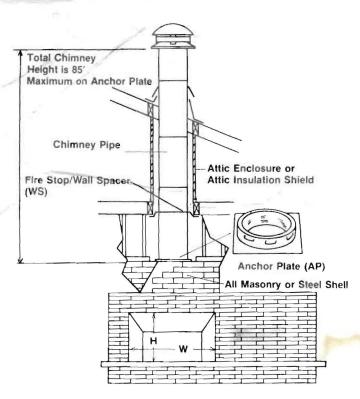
ANCHOR PLATE SUPPORT FOR MASONRY FIREPLACE
